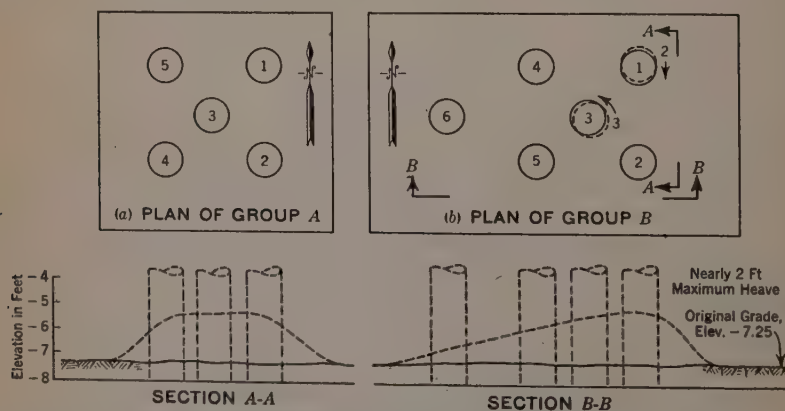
ARRANGEMENT OF PILES AND ORDER OF DIVISION.
